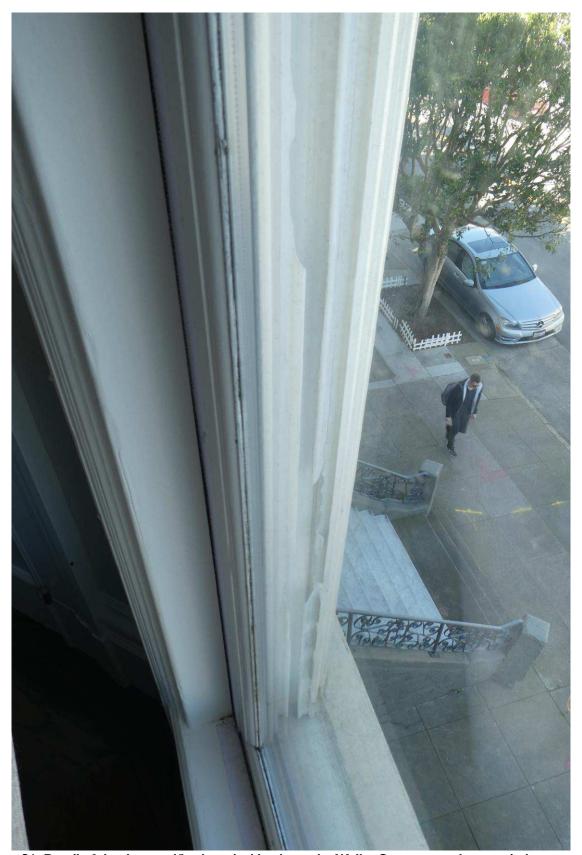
Detail of the damaged/broken vinyl jambs at the Waller Street second story window exterior.
